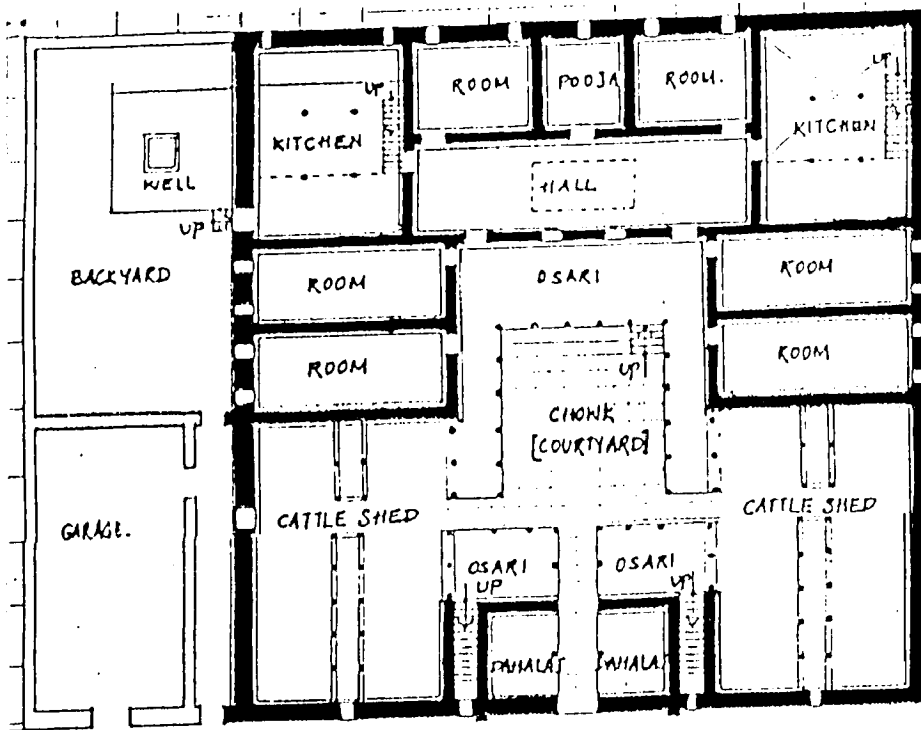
Ground Floor Plan of Baswaraj Patil House.
